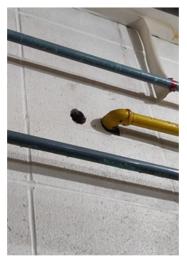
Gap in Fire Separation at Natural Gas Piping Through South Mech Room Ceiling (Typical)
